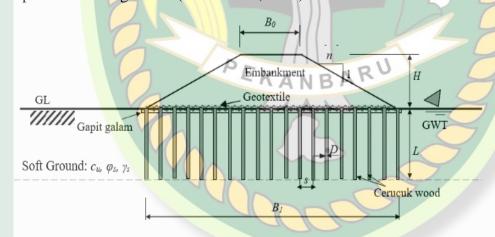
Integration of woven Geotextile and cerucuk wood piles on soft soil for Embankment construction (Sudarwanto, 2017)
